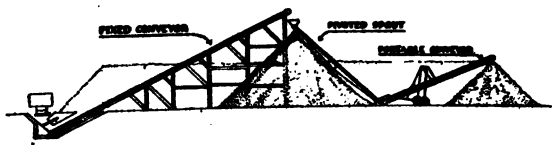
Sketch Showing the Use of Permanent Conveyor, a Chute and Portable Conveyor for Building Storage Piles Well Back from the Railroad Track.
